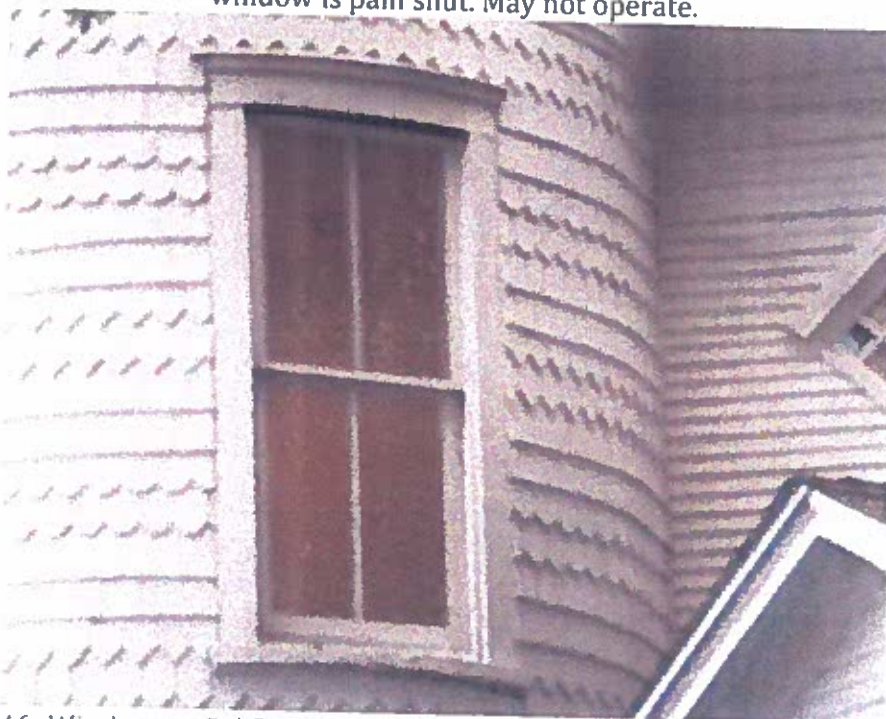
Window on 2<sup>nd</sup> floor of turret facing northwest. Window pane is broken and window is paint shut. It may not operate.
